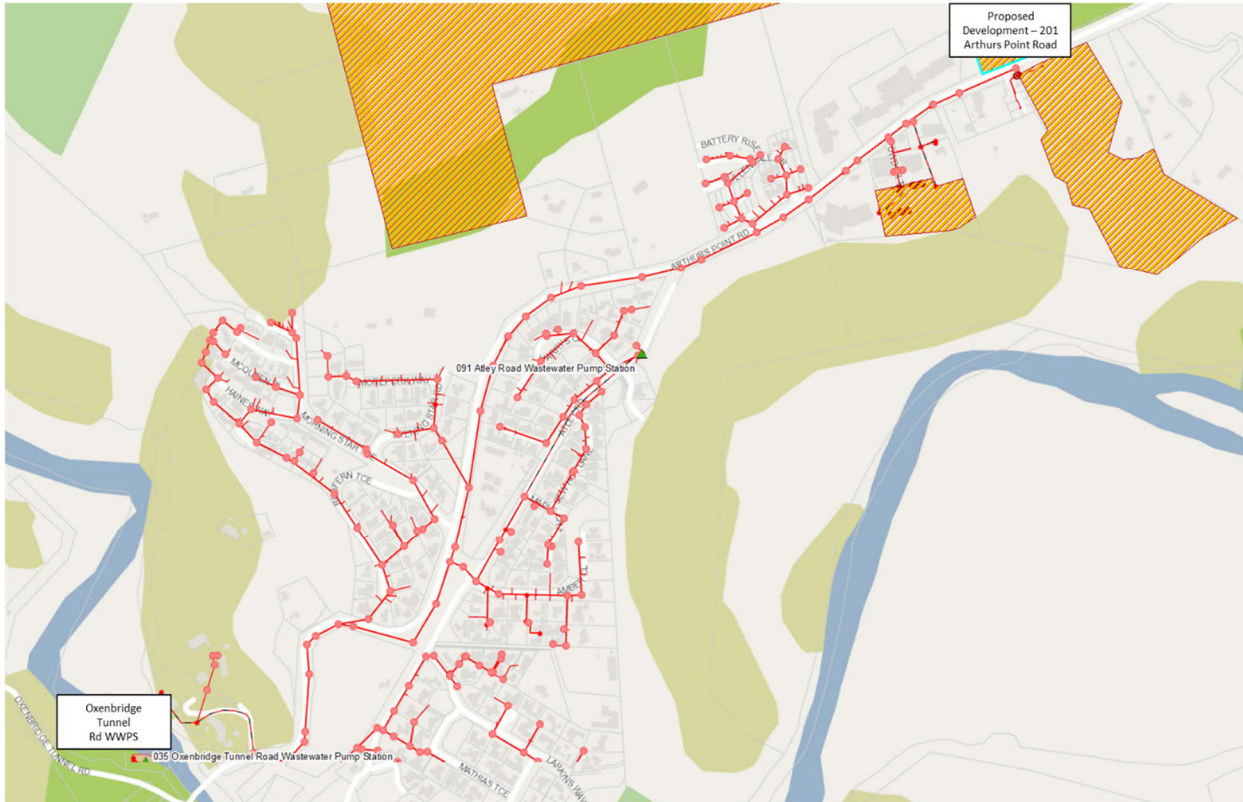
Planview of 201 Arthurs Point Road proposed development and Oxenbridge Tunnel Road Wwps
